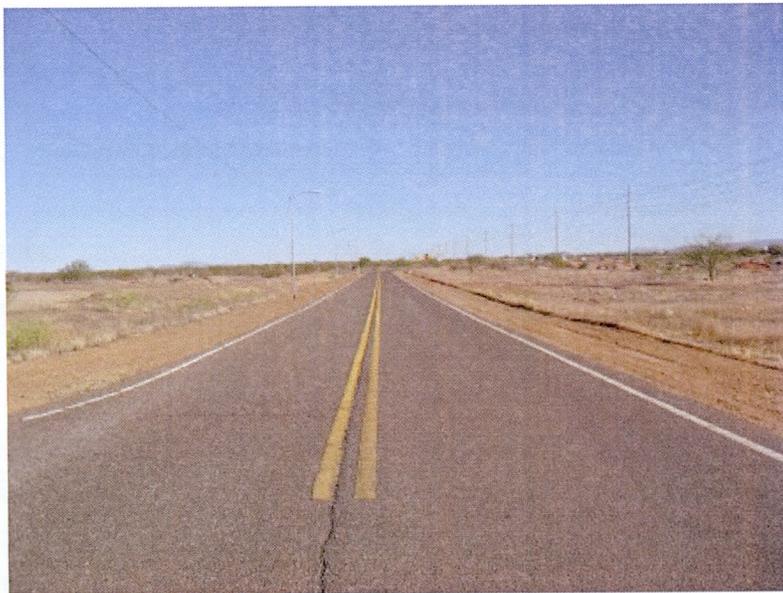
Looking NW at Citrus Road at intersection of Citrus Road and Old Happy Valley Road.
